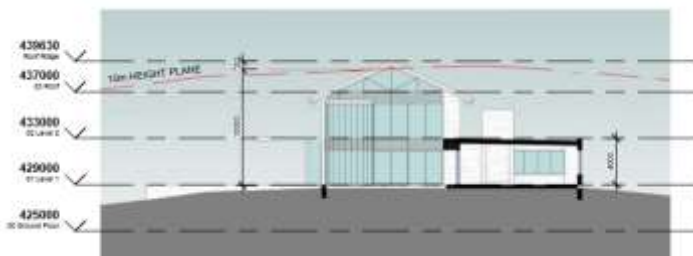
Architect's elevation drawings of the proposed lodge – refer architect's drawings for further details.
